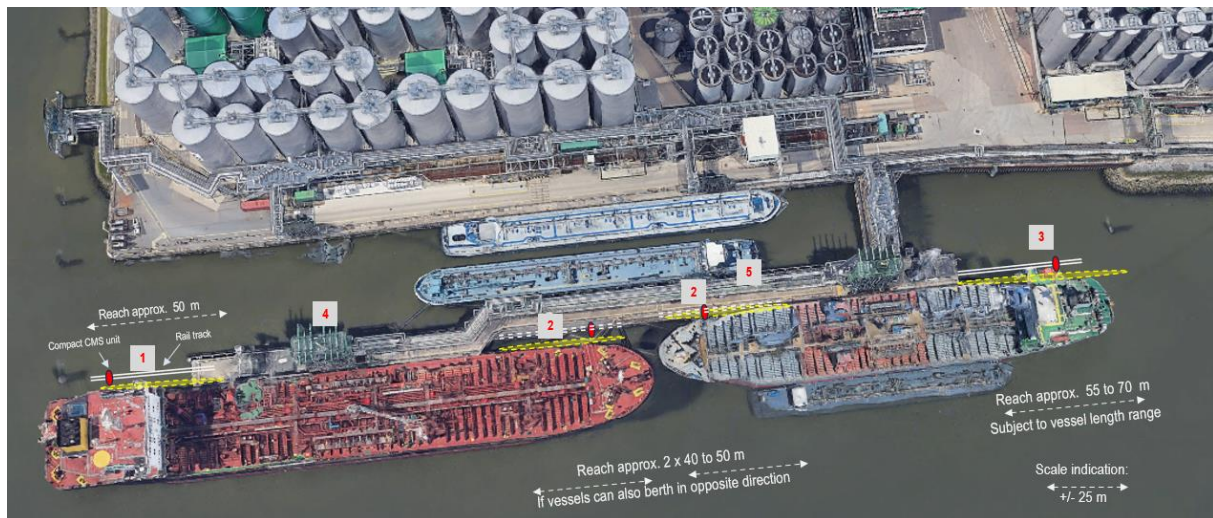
Potential configuration with small hydraulic cable support units running along rail tracks
